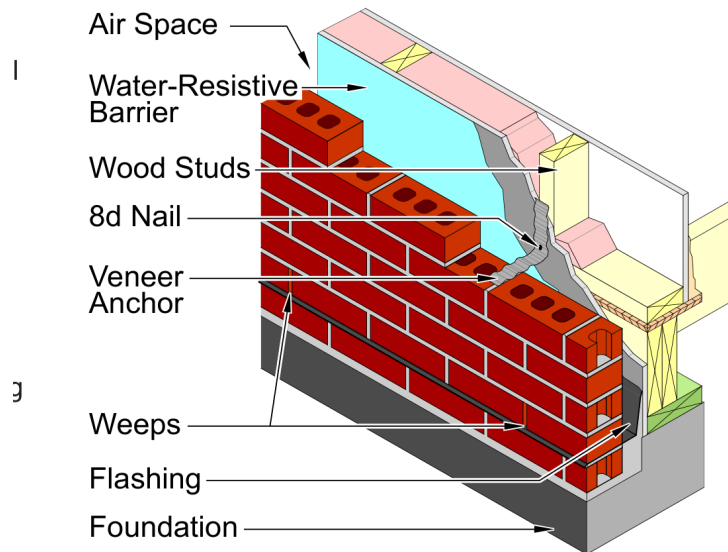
Anatomy of a brick veneer/wood stud wall: air space, water-resistive barrier over the sheathing, wood studs, veneer anchor, weeps, flashing, and foundation. Why it matters: every one of these layers is doing a specific job — skip or shortcut any single one and the whole drainage system stops working, brick above it notwithstanding.
